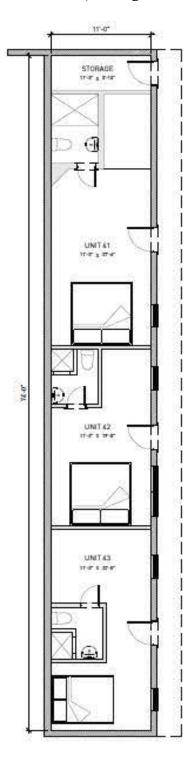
Grandview Courts-Siesta Motel As-Built Plans (Baldridge Architects, 2023): Building C.
